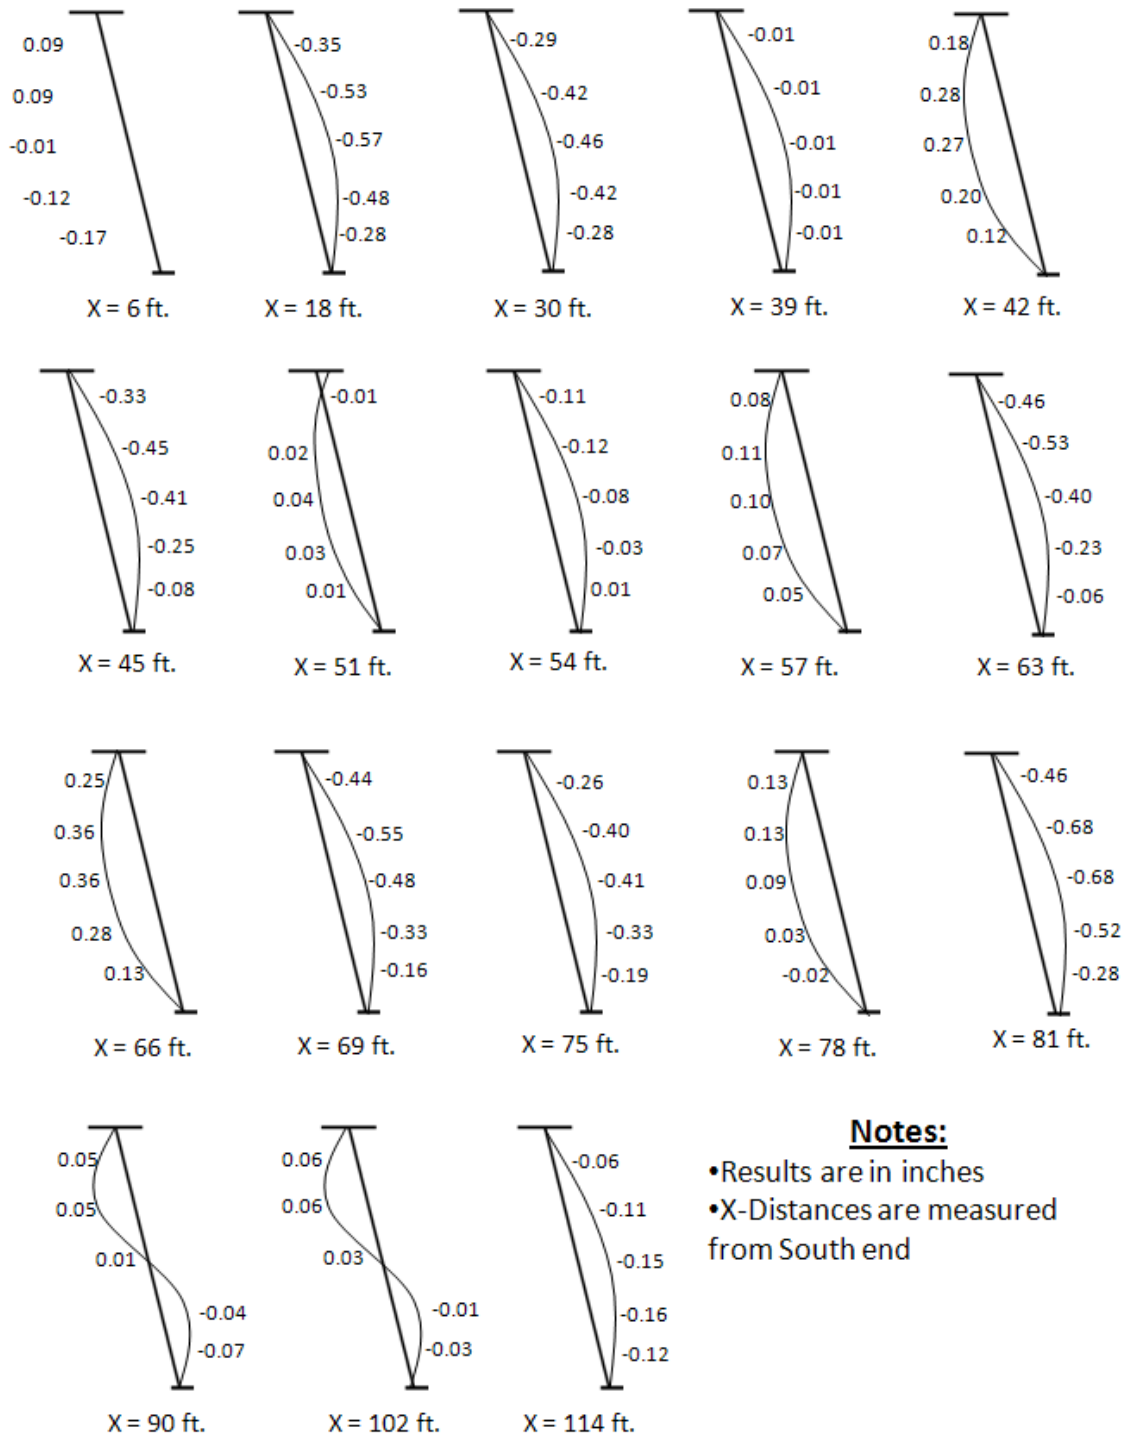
Exterior Girder Outer Web - After Casting of Deck
